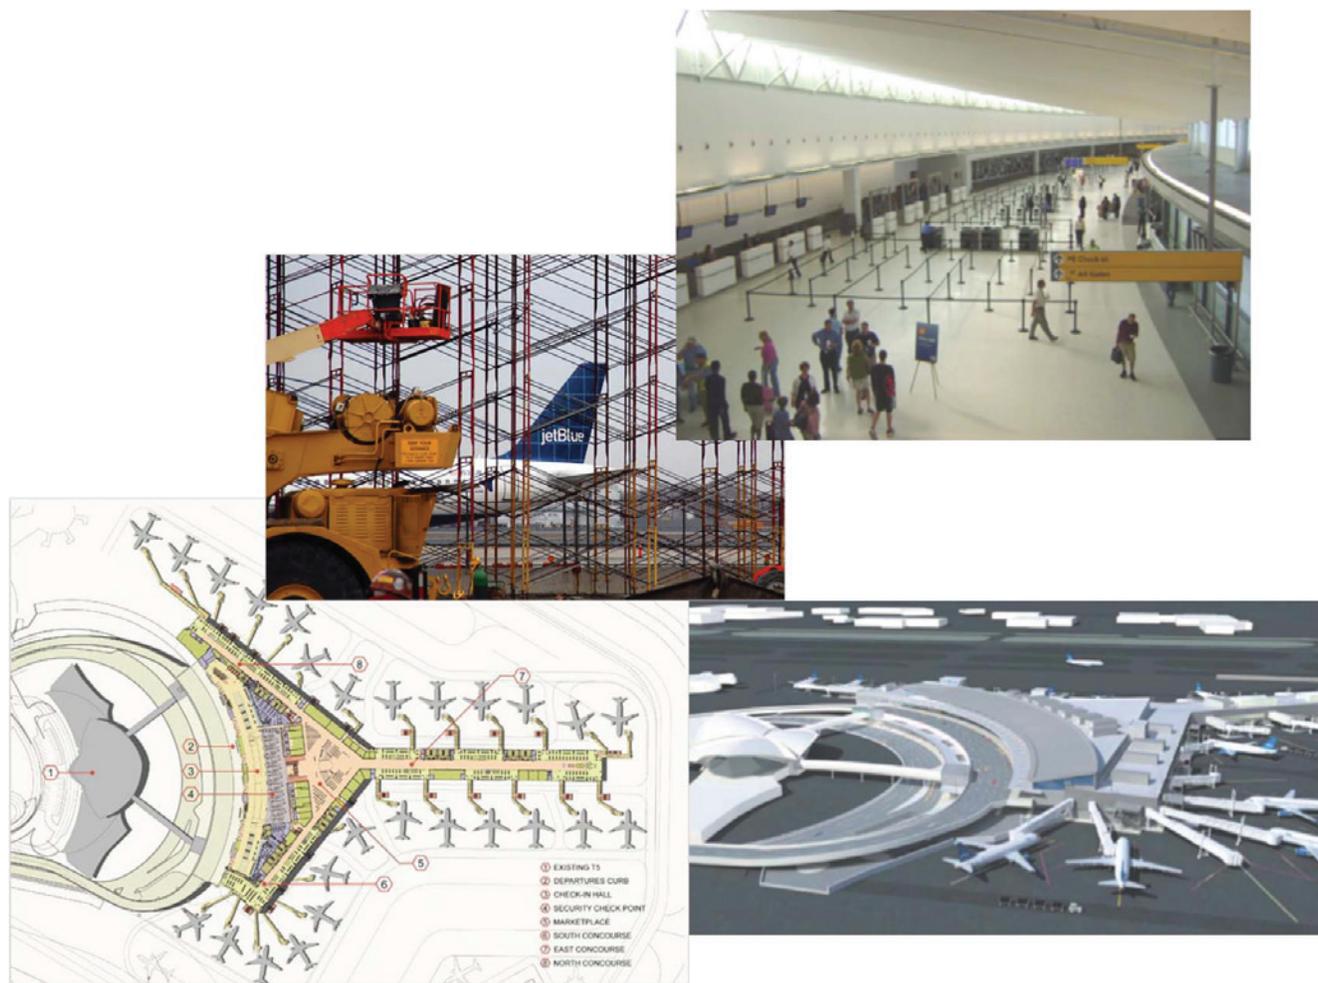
JFK Terminal 5 plans, model, construction, and interior.
